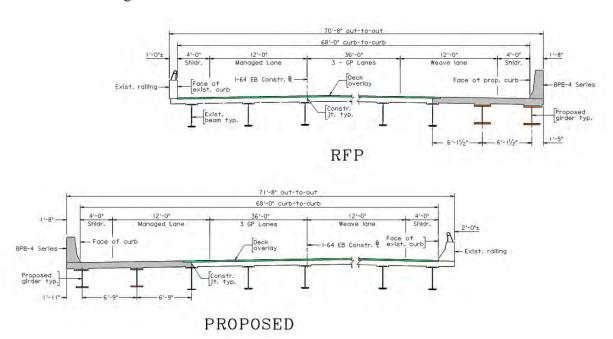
Revised Widening of I-66 EB over Tidewater Drive
